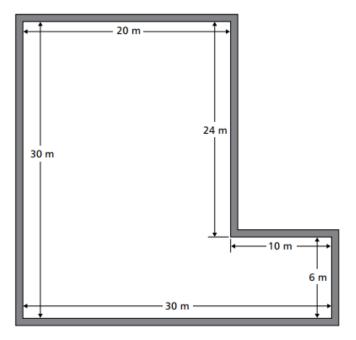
Example 3.4 in CIBSE Section 3.5 indicating the floor area and the floor perimeter is calculated from calculated from the interior surface of the external wall surrounding the floor
